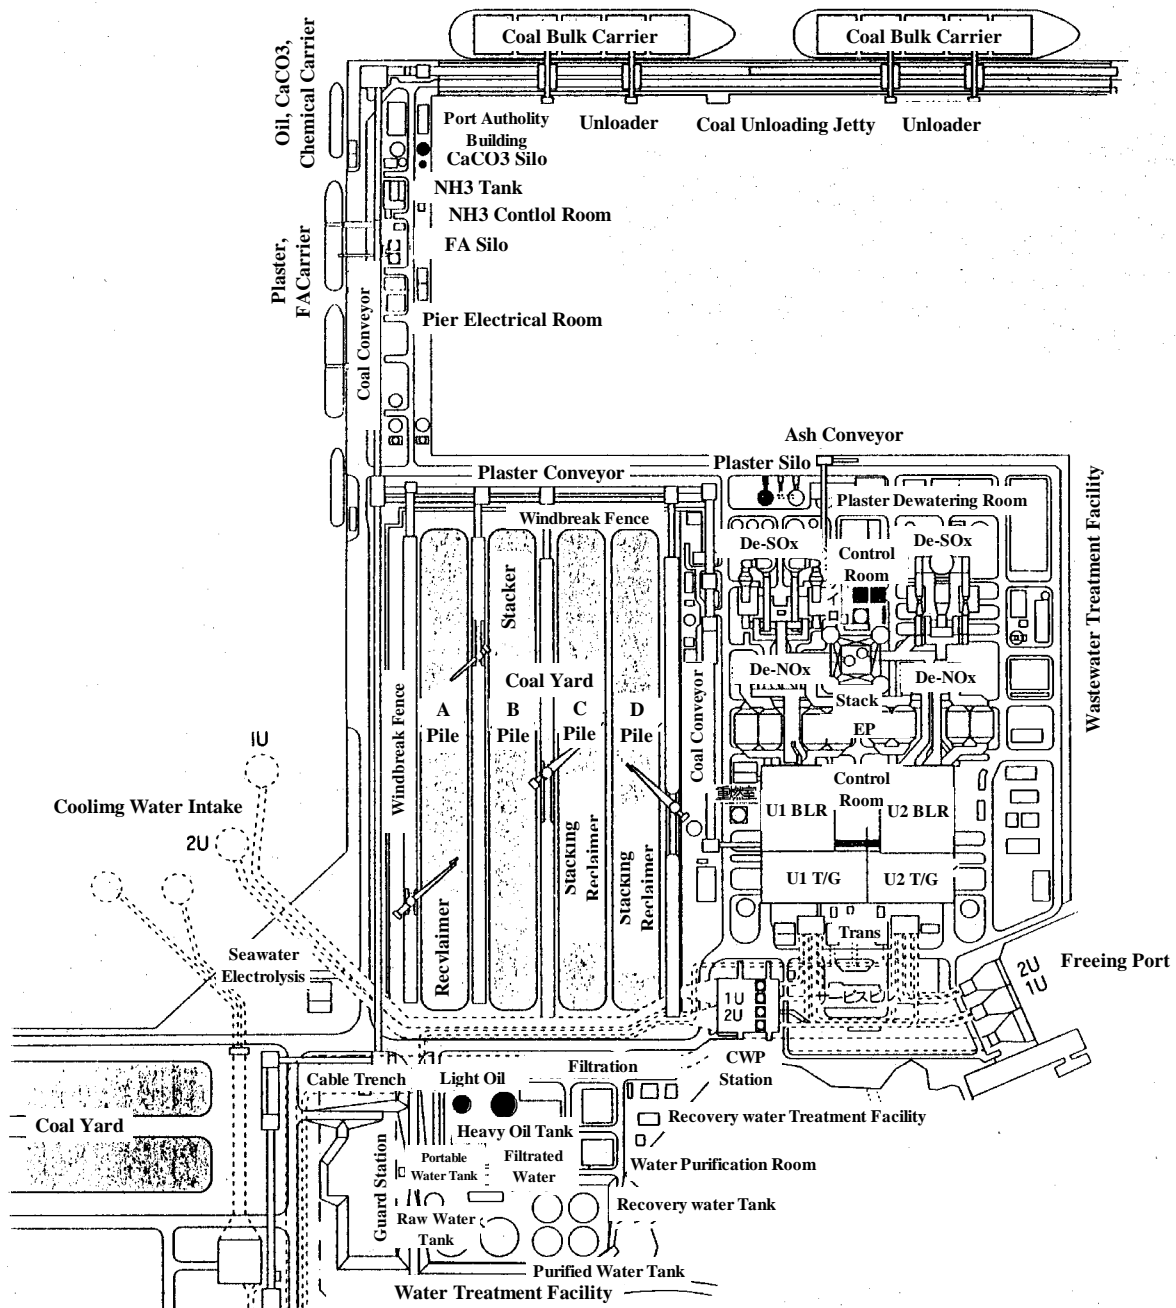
Layout of coal receiving and storage facility (outdoor type)
